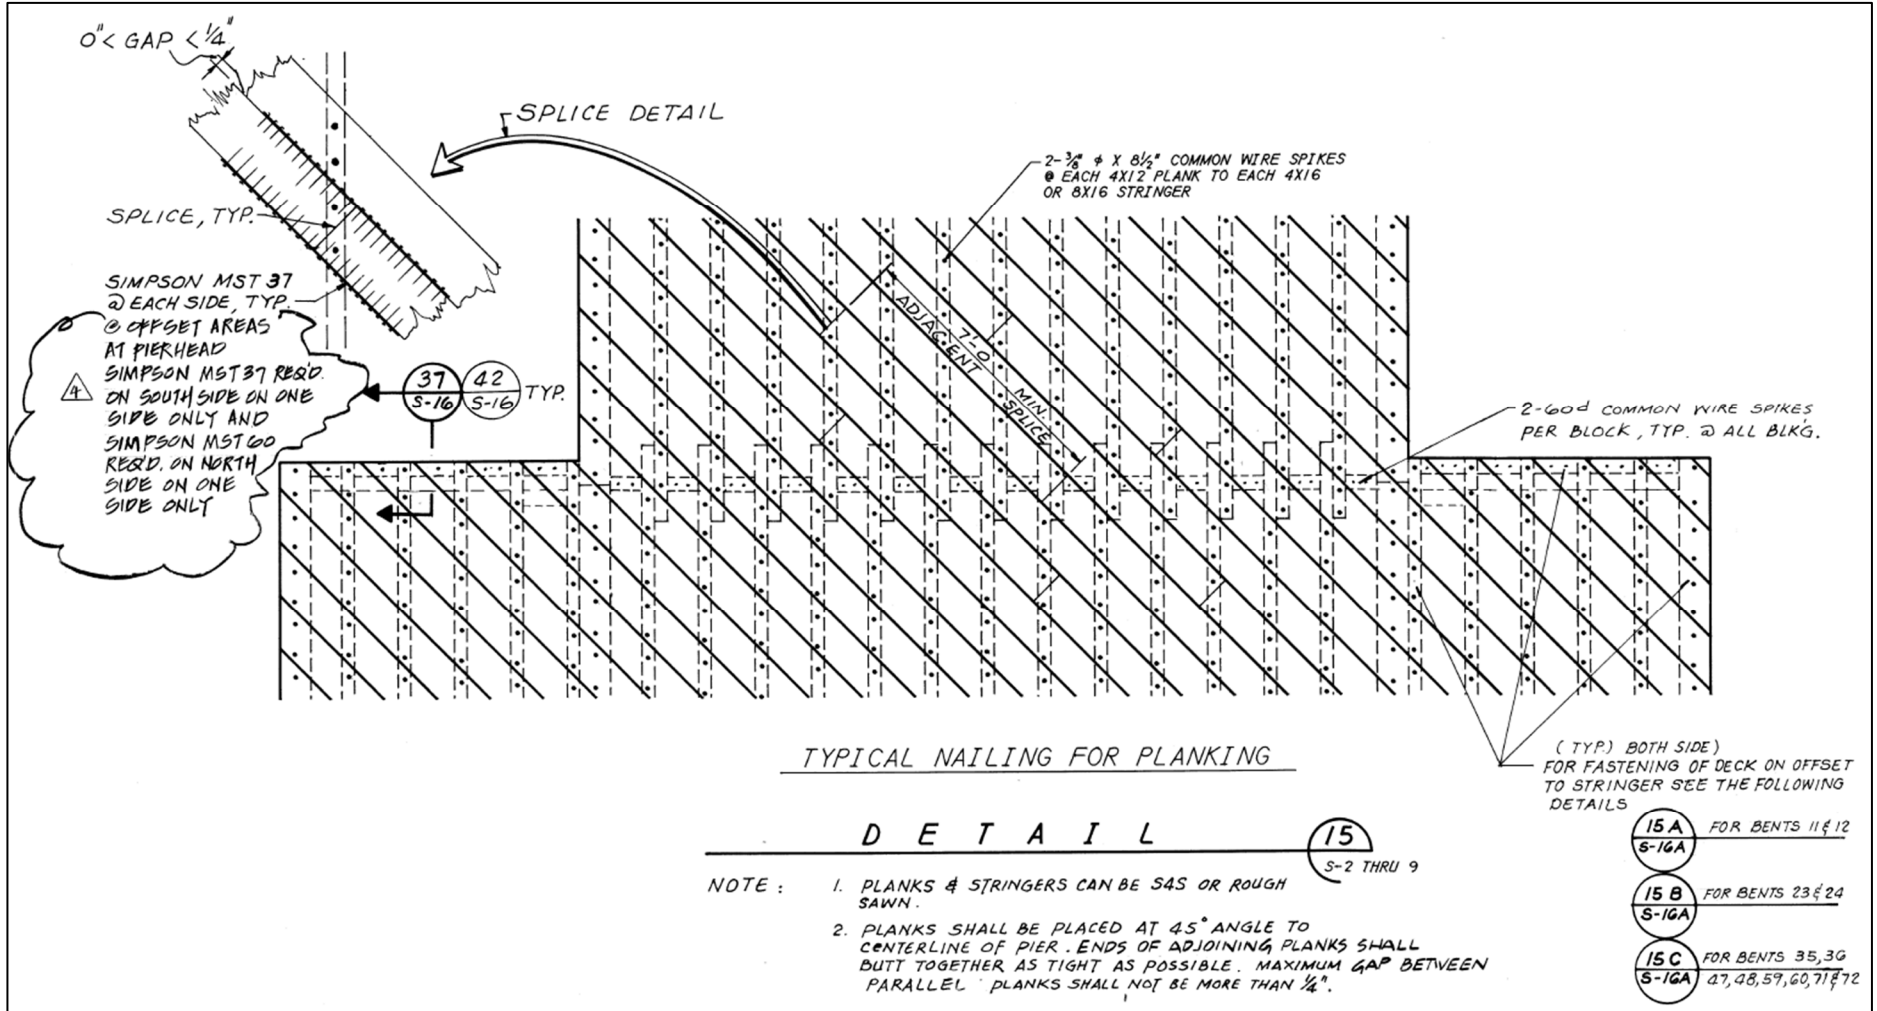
Existing Pier Nailing Detail, reference detail 15 on S-13. For fastening detail around popout see 37/S-16 and 15B/16-A.
